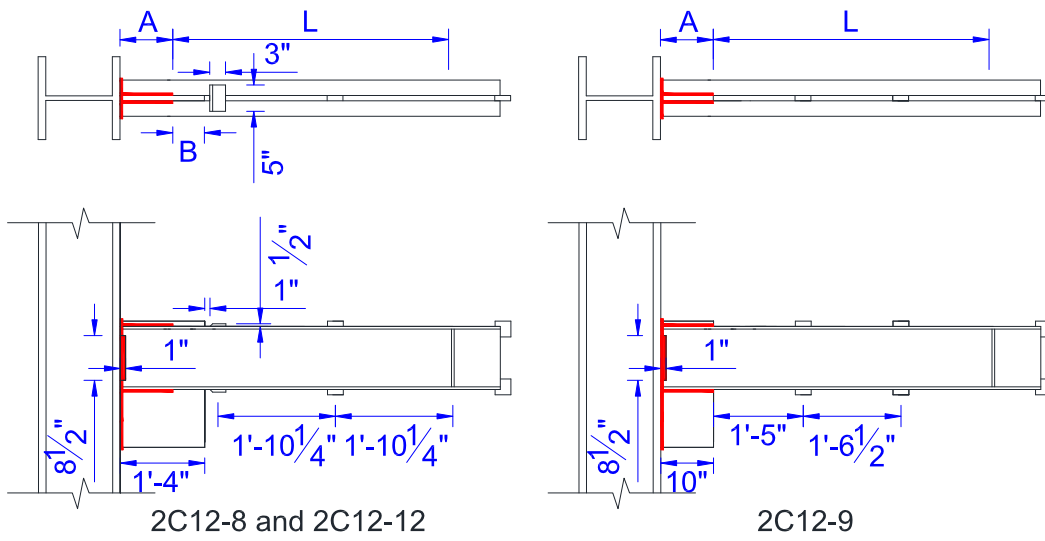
Dimensional Details of Specimens 2C12-8, 2C12-9, and 2C12-12
